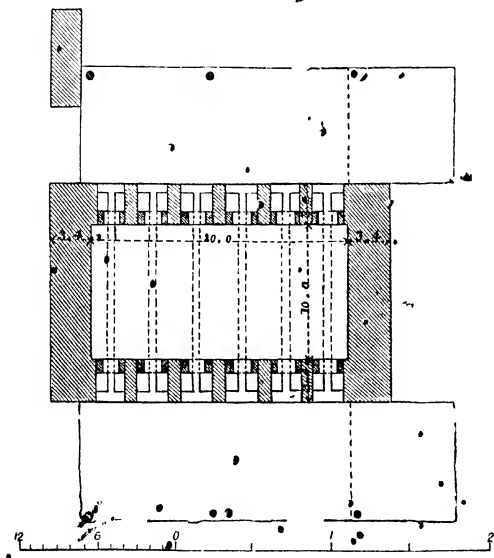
Plan of kiln at ground-level, showing firing sheds and fire-holes.
